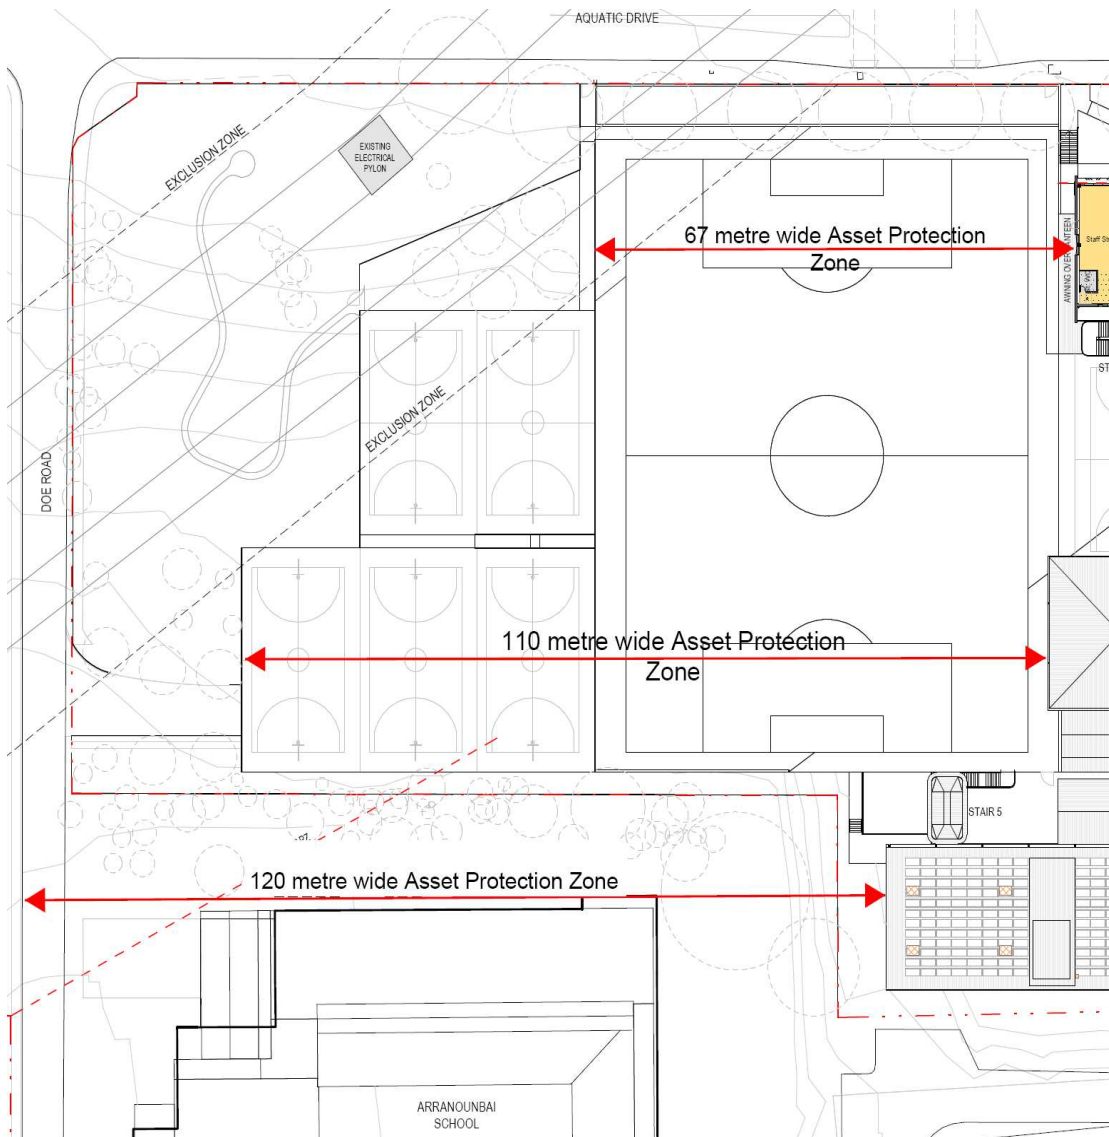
Plan of Asset Protection Zone – Westerly Fire Path.
